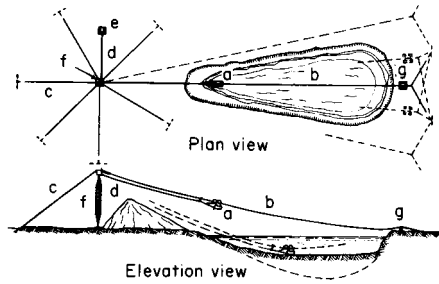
Slackline-cable plant. (Sauerman.)
